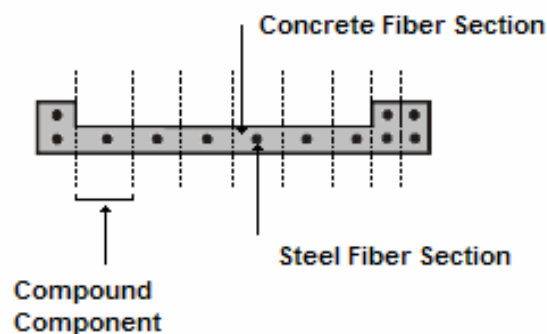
Shear Wall Element with Fiber Sections [5]
